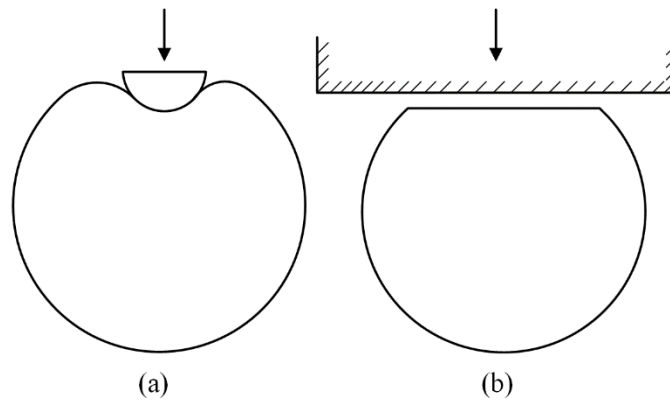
Cross sections of ring stiffened columns subjected to lateral impact
